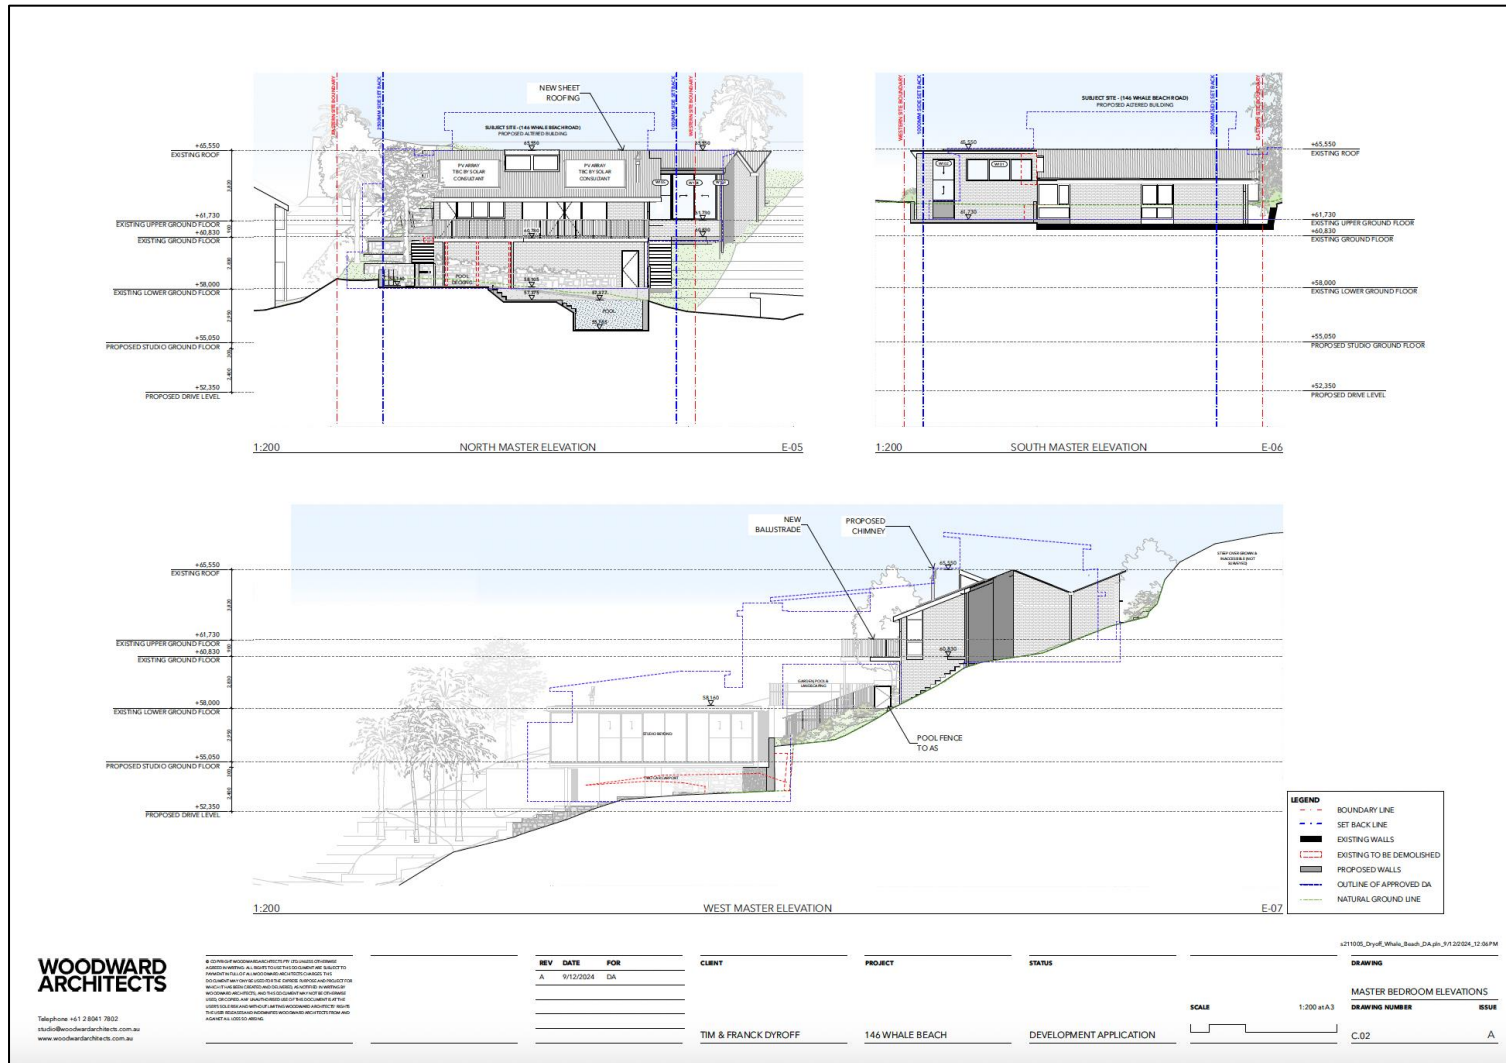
ILLUSTRATES PROPOSED MASTERBEDROOM ELEVATIONS
